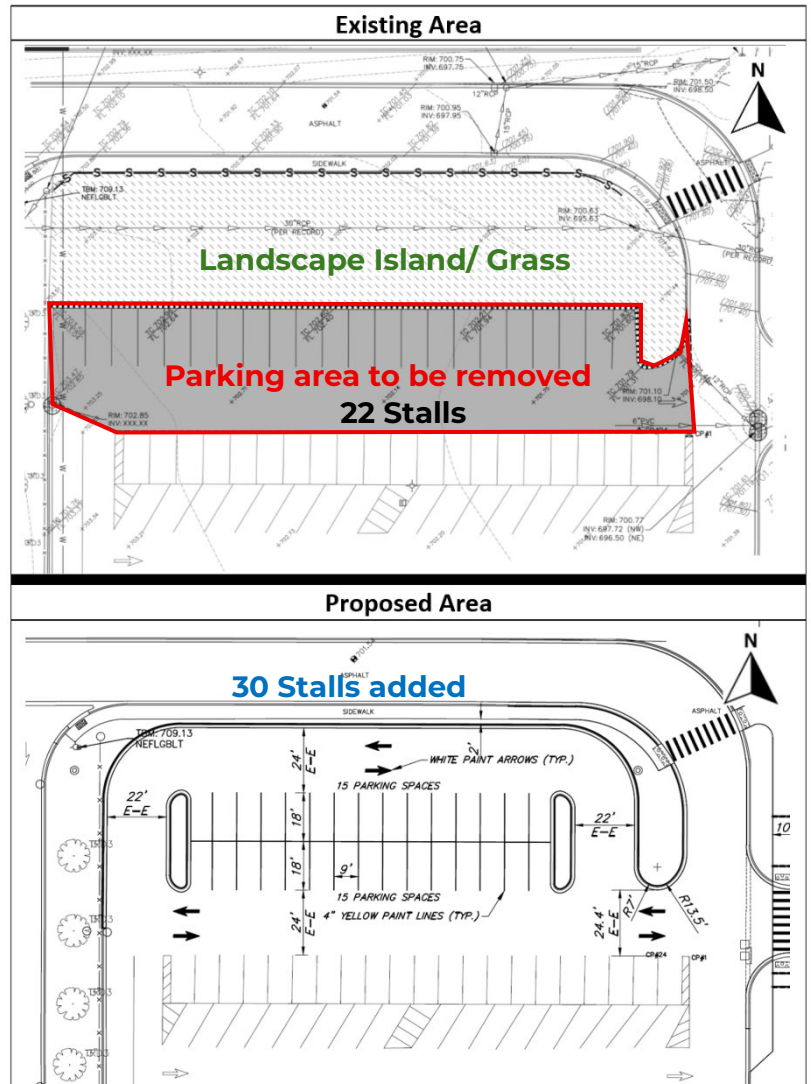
Existing & Proposed Expansion of Parking Lot Area
